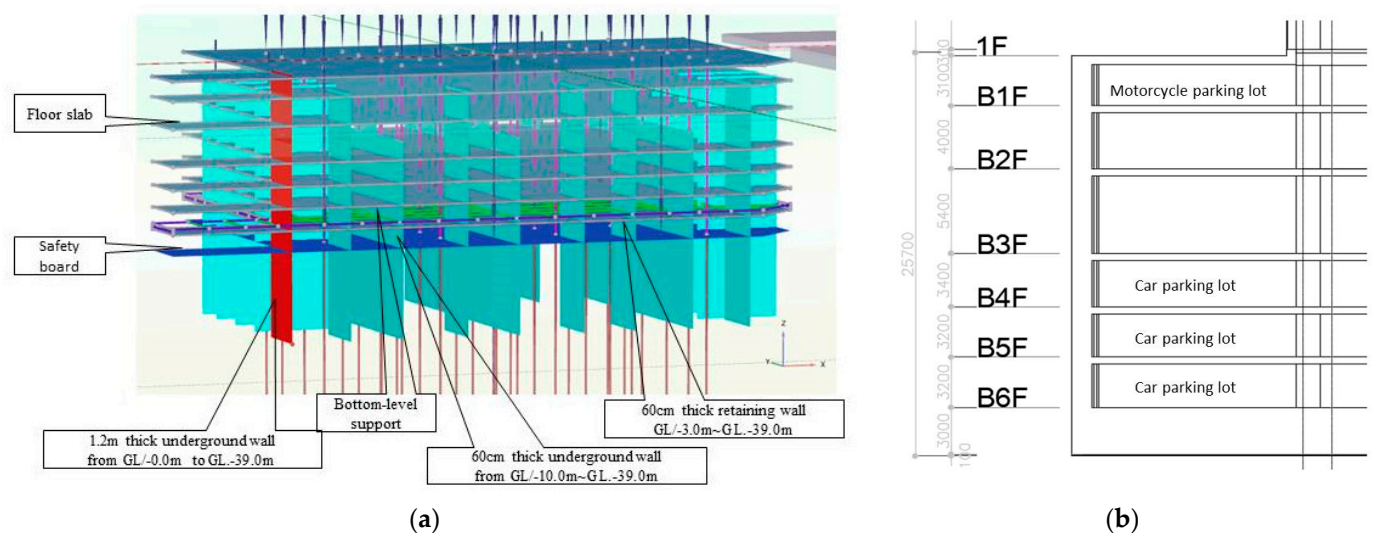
(a) PLAXIS 3D configuration of Cross wall, buttress wall, and pile wall; (b) Elevation layout of floor and foundation slabs.
